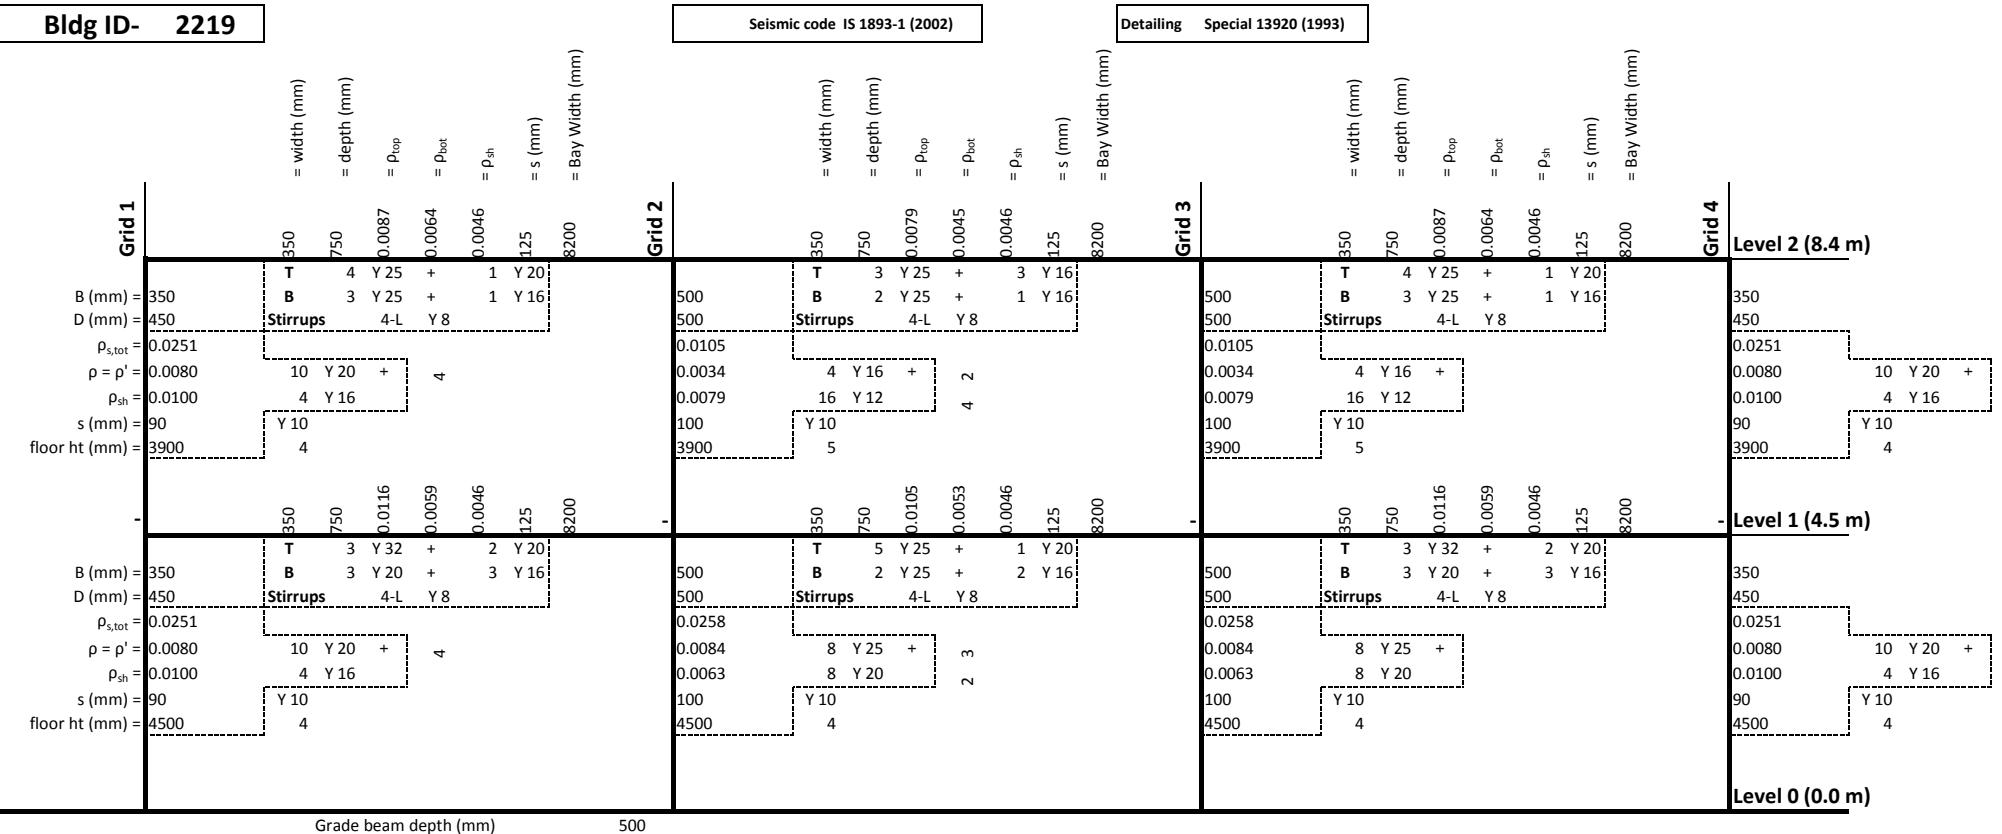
Provided reinforcement and modeling details for building ID 2219
